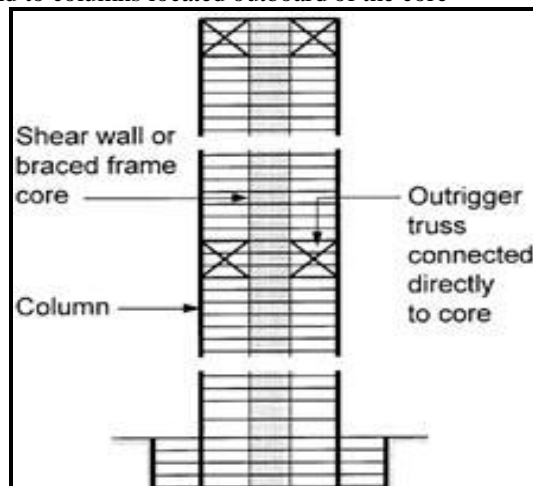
CONVENTIONAL OUTRIGGER STRUCTURAL SYSTEM
